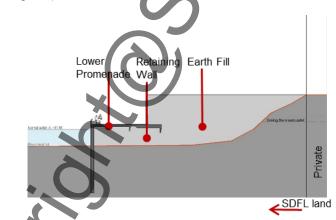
The Construction Process- Retaining Wall and Earth Fill
